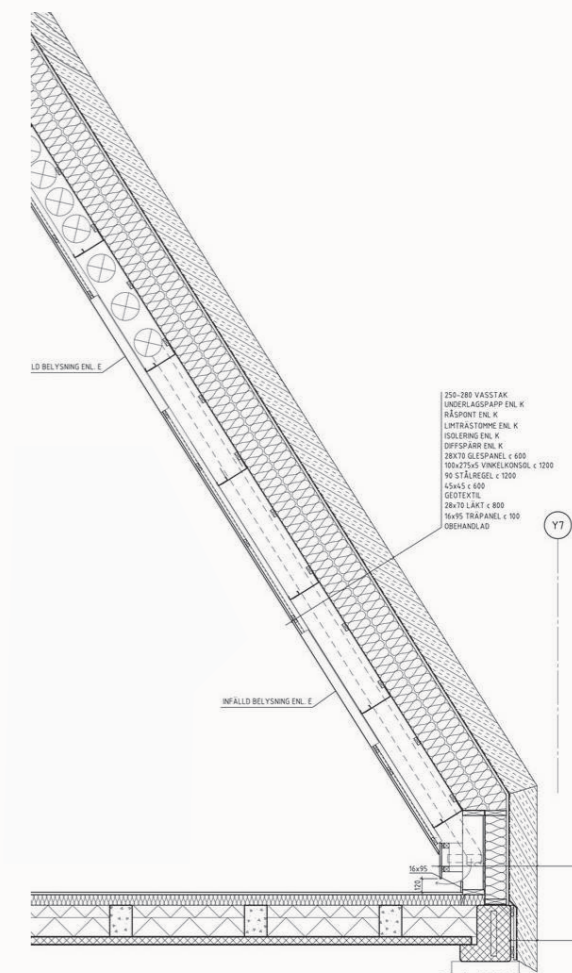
Detail drawing Tåkern, Image: Svenskt trä
